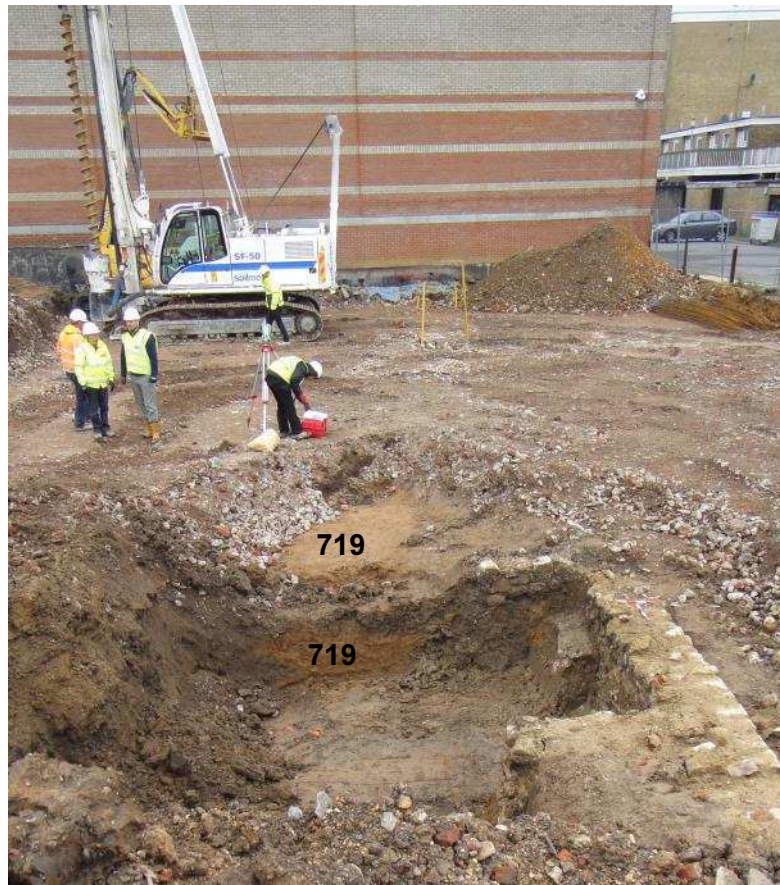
Trench 7 looking north showing south-facing section and possible natural brickearth 719. No scales. The upright yellow poles in the background demarcate the approximate location of N-S aligned wall 209 located in trenches 2 and 6A of investigations.
